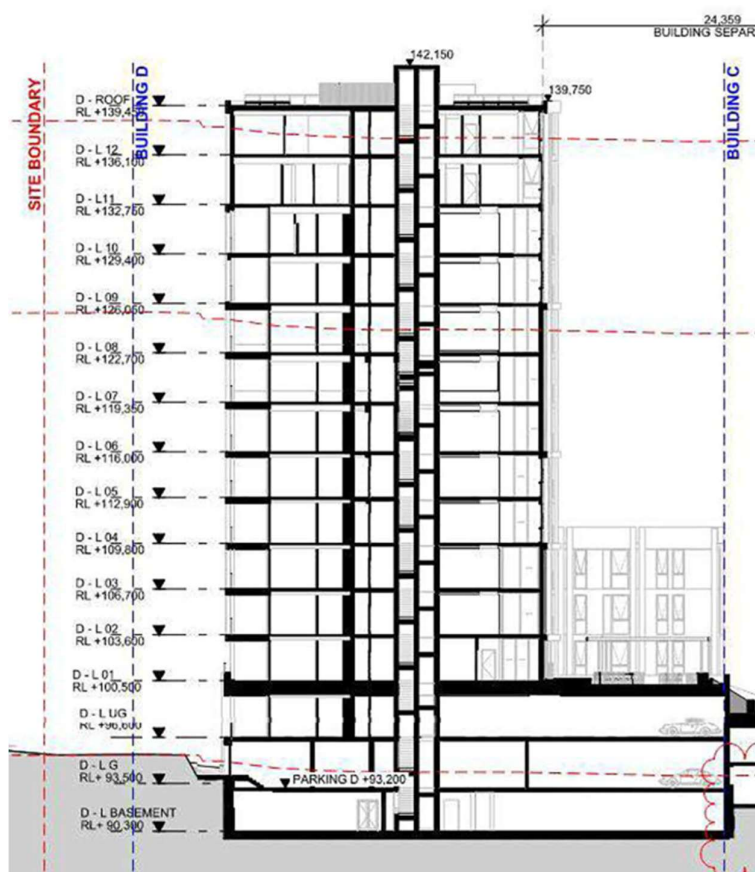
Approved and Proposed E-W Section of Building D (1 of 5)
